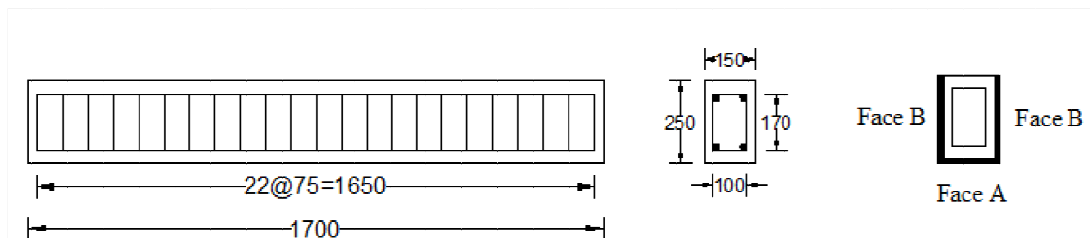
Geometry, FRP layout and steel reinforcement for FE beam models
